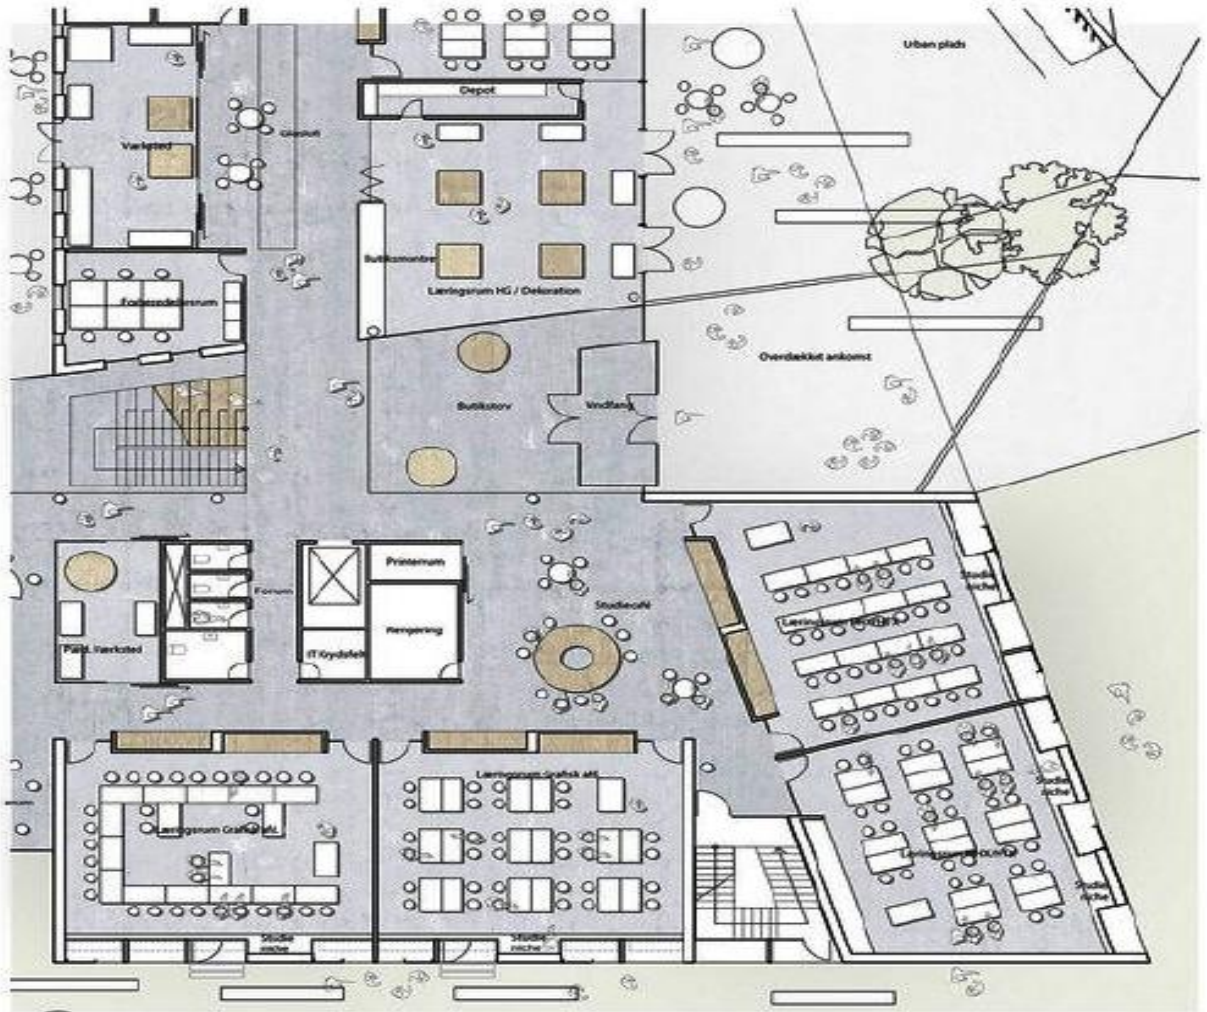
Detailed Floor Plan Source: archdaily.com (2022)
